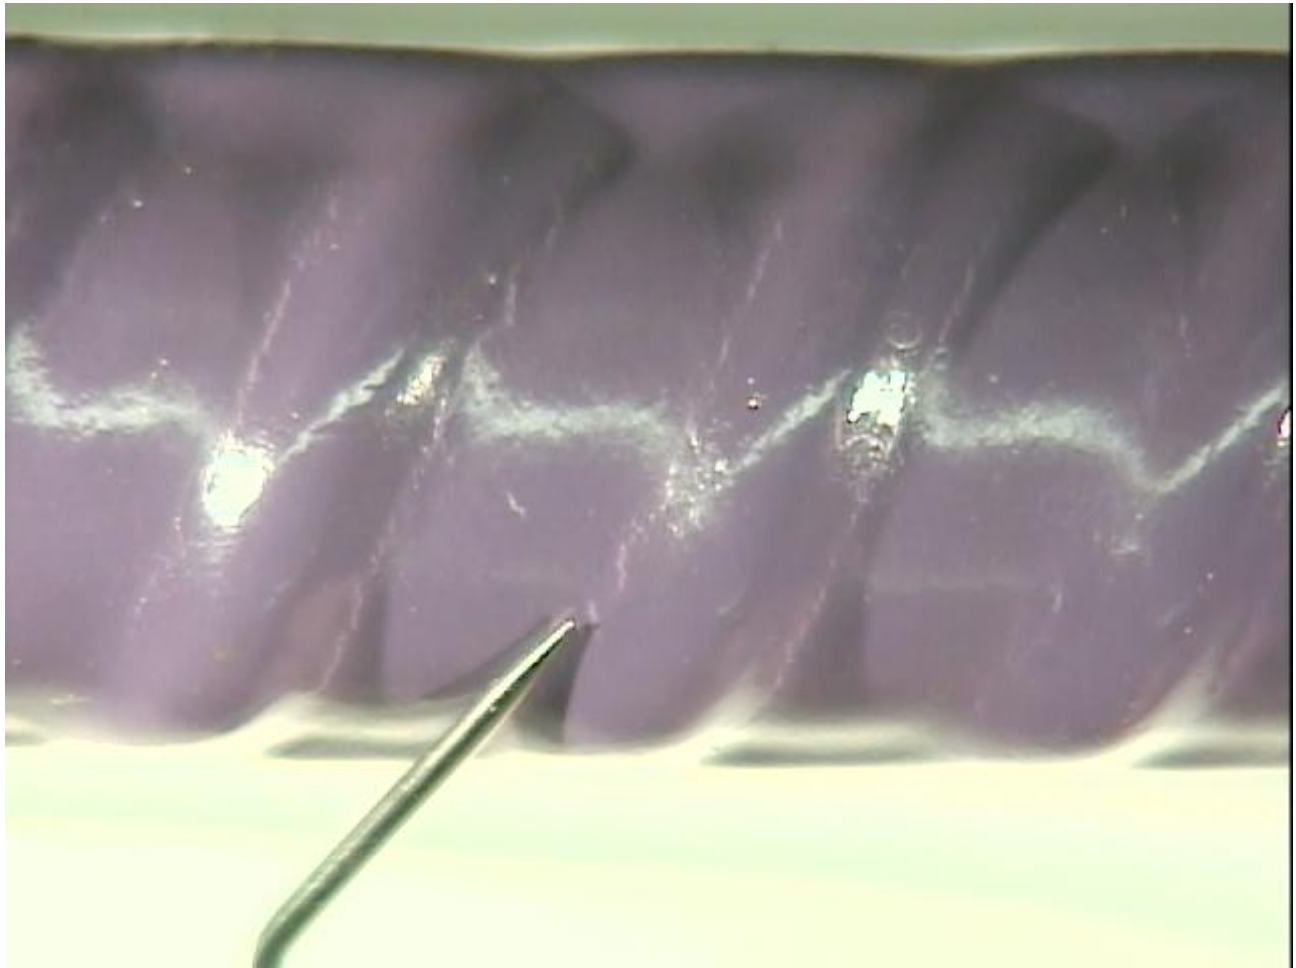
Test sample showing discoloration in coating after the bend test. This type of discoloration is due to stretching of the coating during bending and is typical. Discoloration of the coating after bending does not constitute a failure of the bend test.
